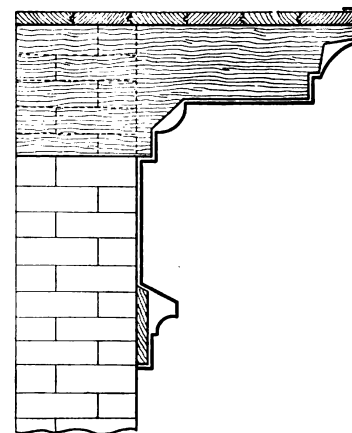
Wooden Lookout Placed on Top of Wall.
